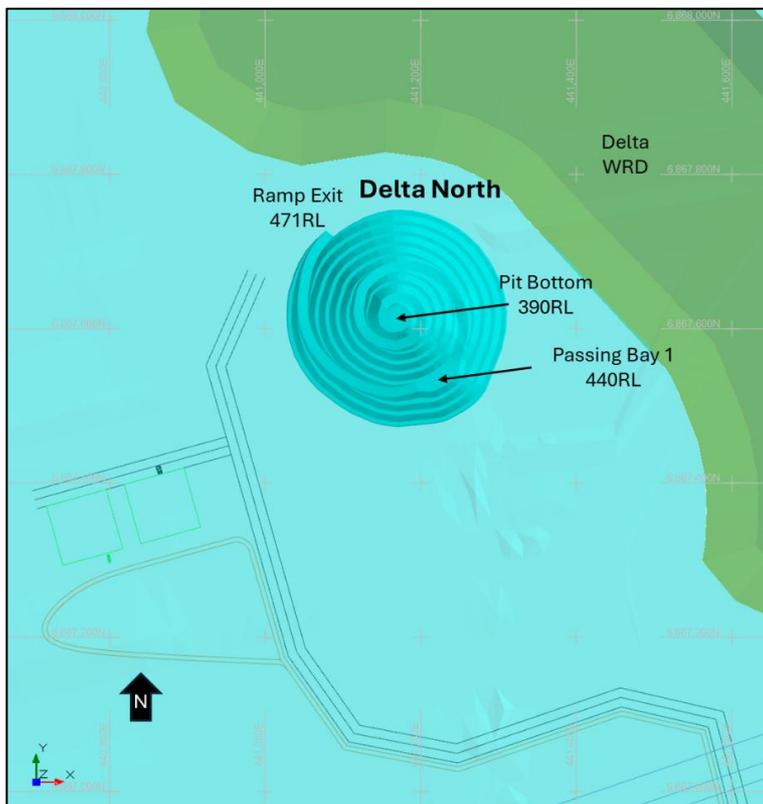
Plan view – Cork Tree Well (Delta) pit design
